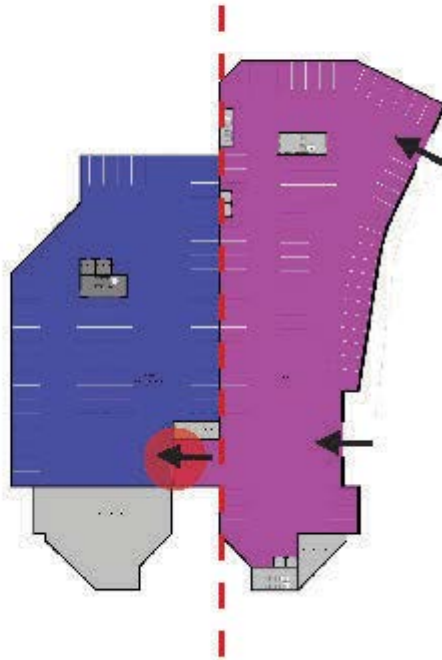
Underground Parking – Cultural center parking on right, Embassy parking on left – Image by : Author
